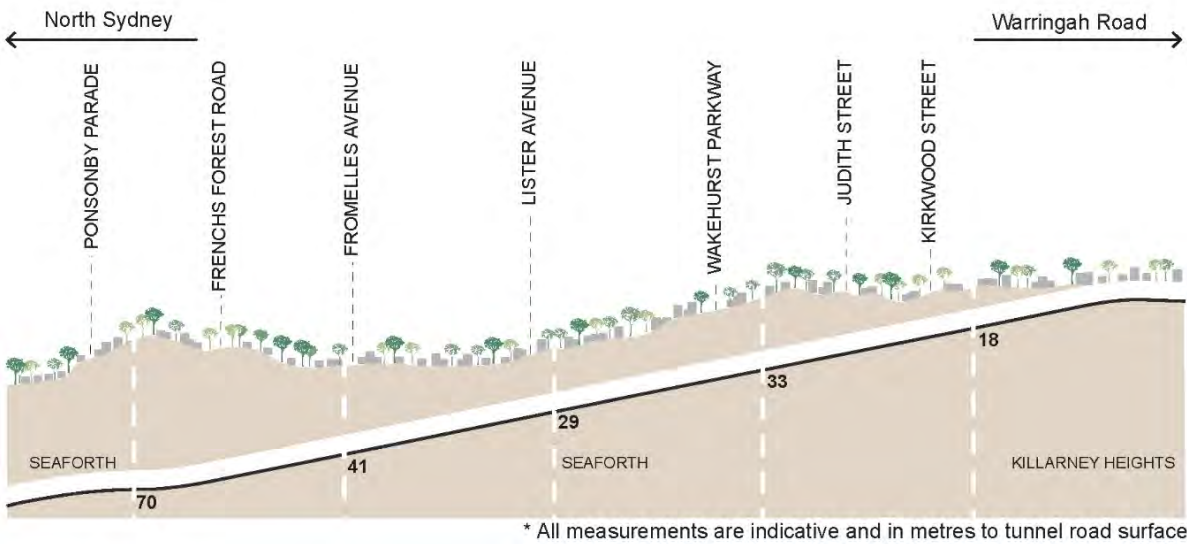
Indicative vertical alignment of the ramp tunnel connection to the Wakehurst Parkway
